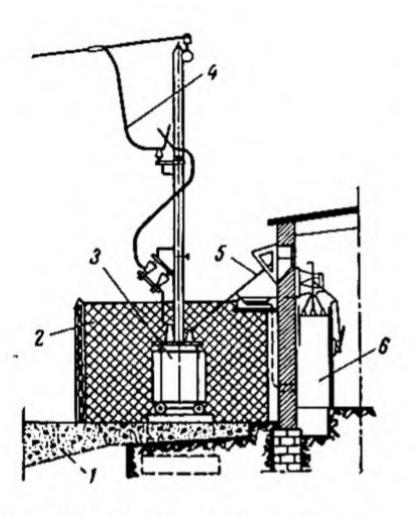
Sectional view of a transformer substation partially built into an industrial shop:
